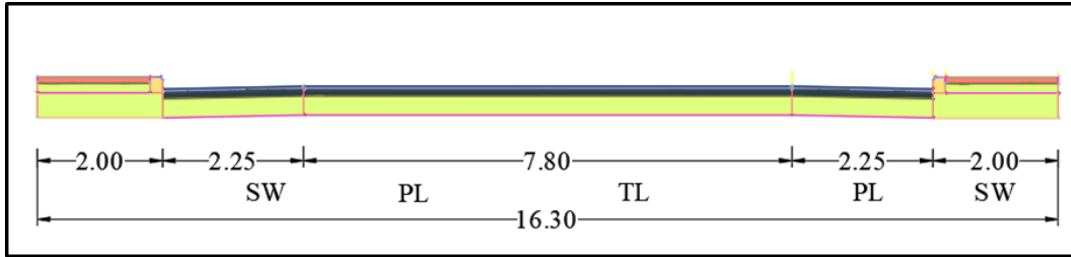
At Al-Shwetreh Street Existing Cross Section
